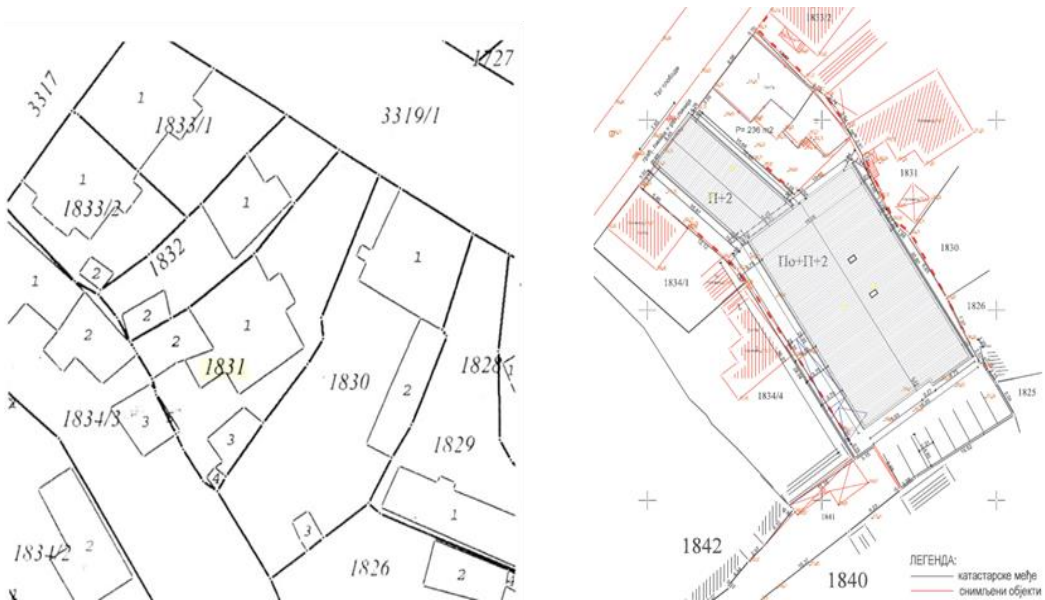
Copy of the plan CP 1831 (left) and the situational plan with the newly designed building (right)
